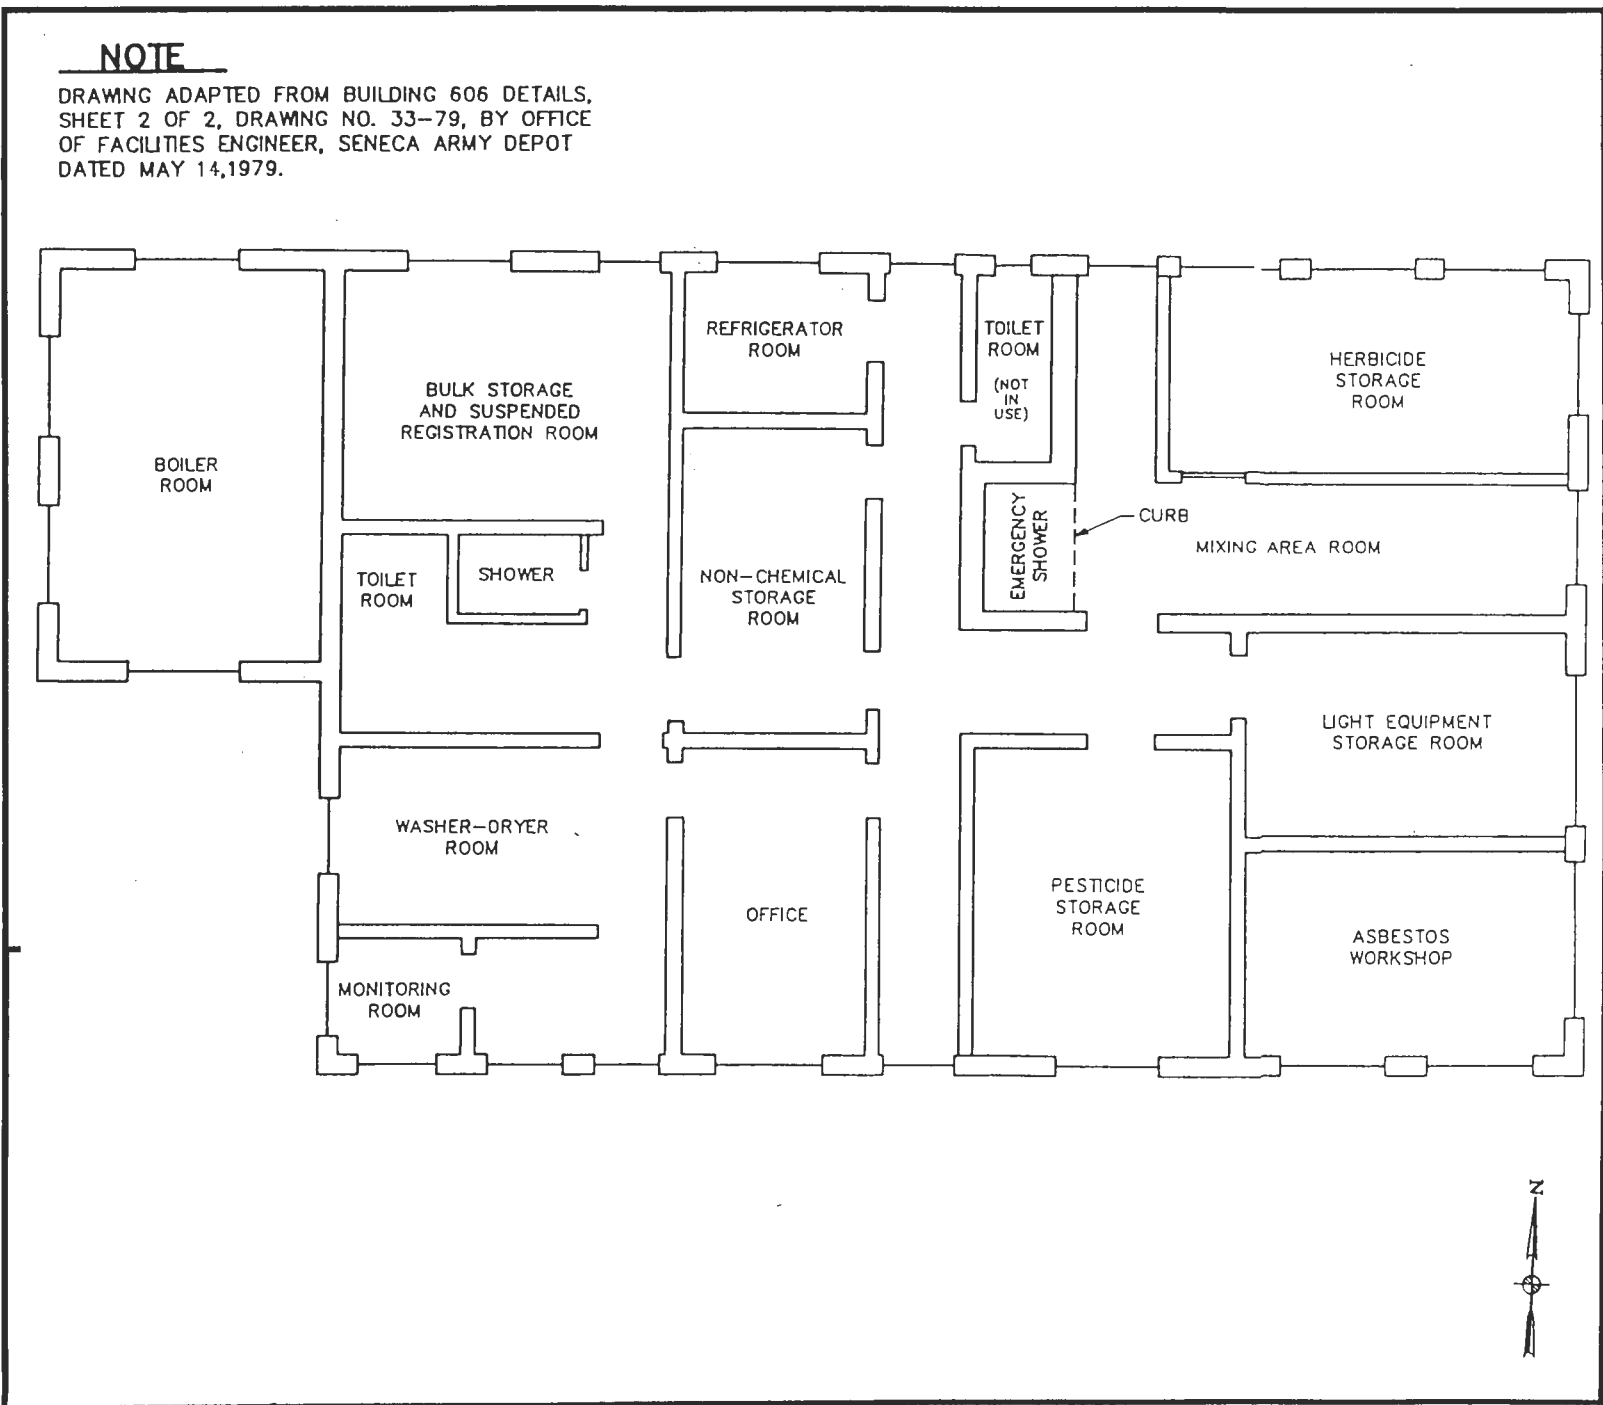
Sampling Plan for SEAD 43, 56, 69: Plan View of Building 606
